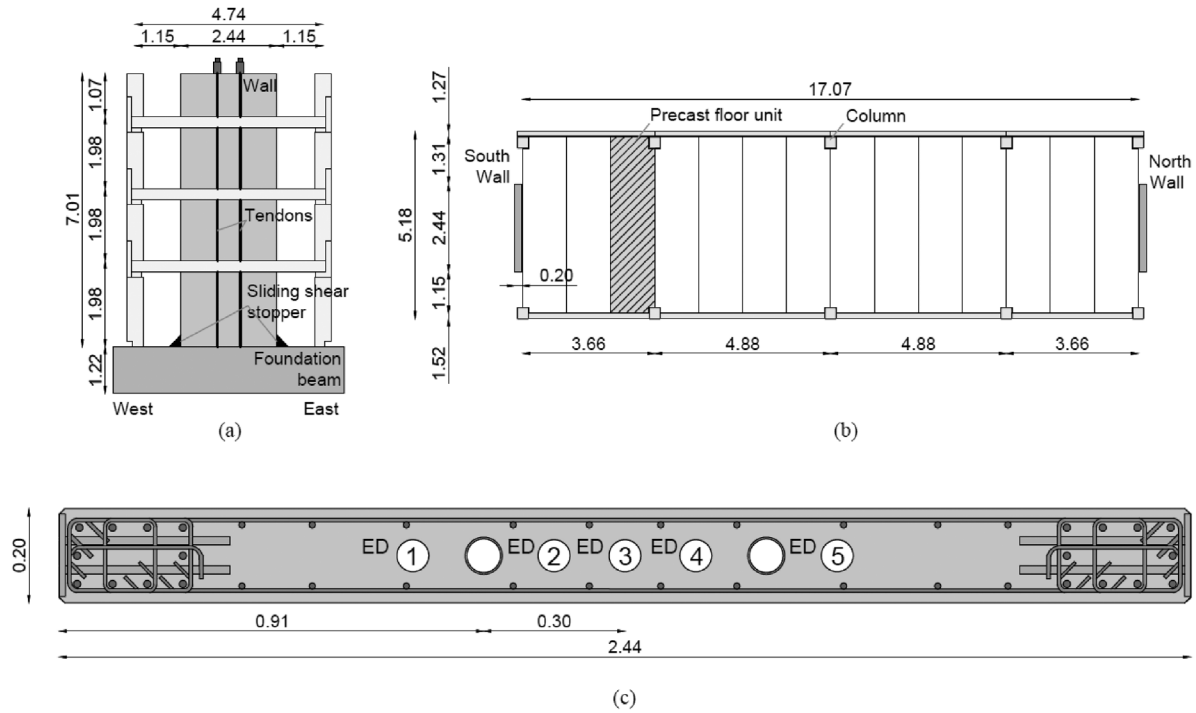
| (a) Geometry of the wall, (b) plan view of the building and (c) wall base cross-section. The measurements are expressed in meters.
